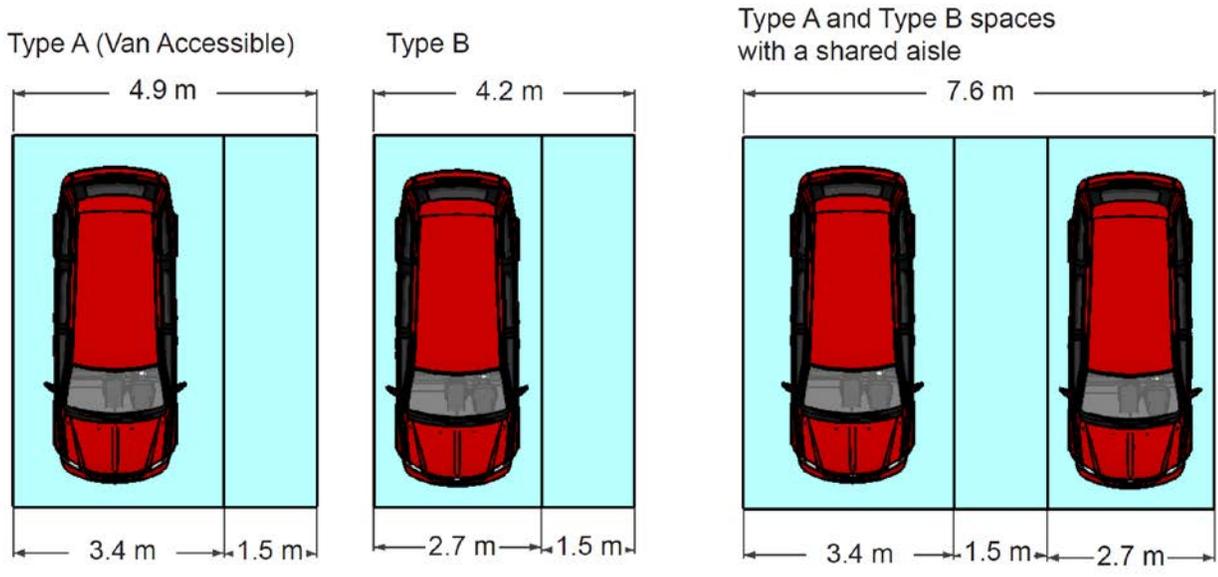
Proposed Zoning Requirements for Accessible Parking Space Dimensions
